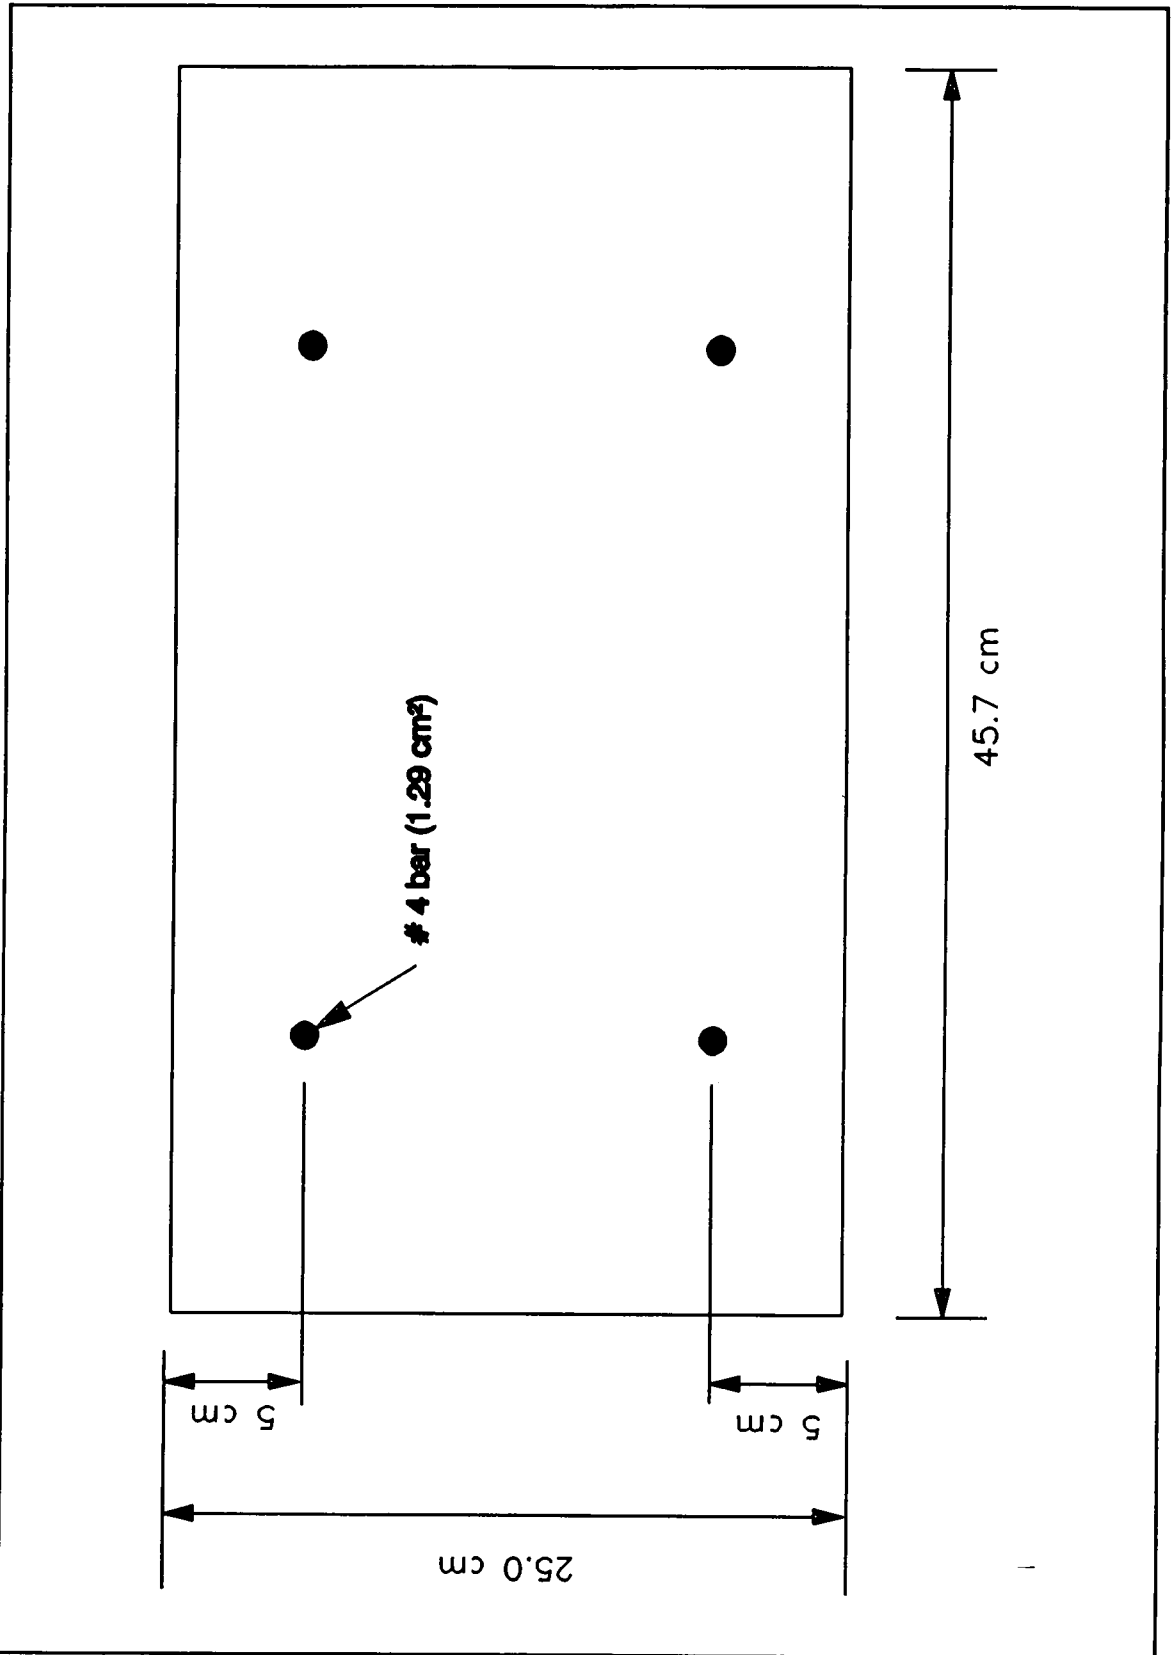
Cross-Section of Reinforced Concrete Footing
